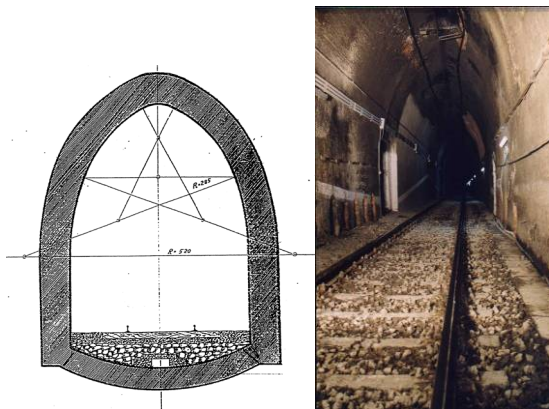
Old Castellano tunnel: Typical cross section (at the left), image taken from inside of tunnel (at the right)
